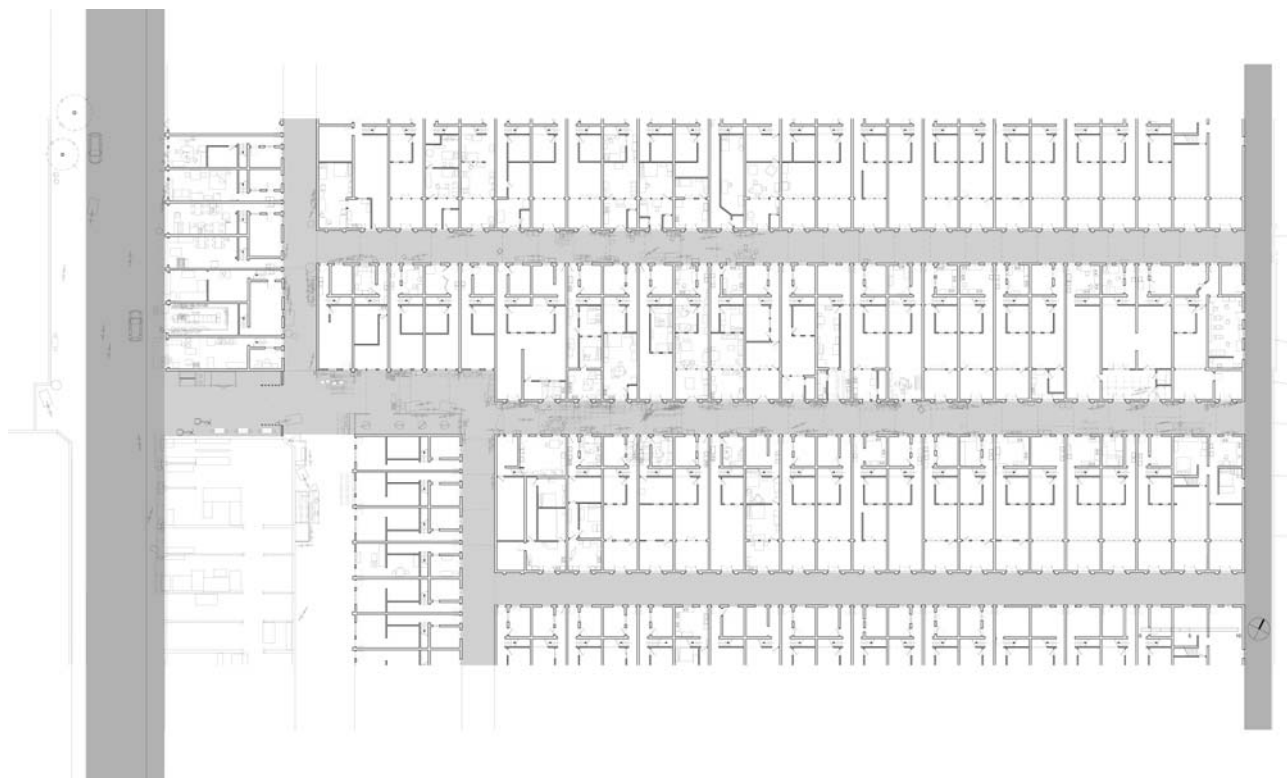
Lilong* as occupied, 2007. Suzhou Creek is just north of this compound, and Datian Road is shown to the west (drawing by author)
